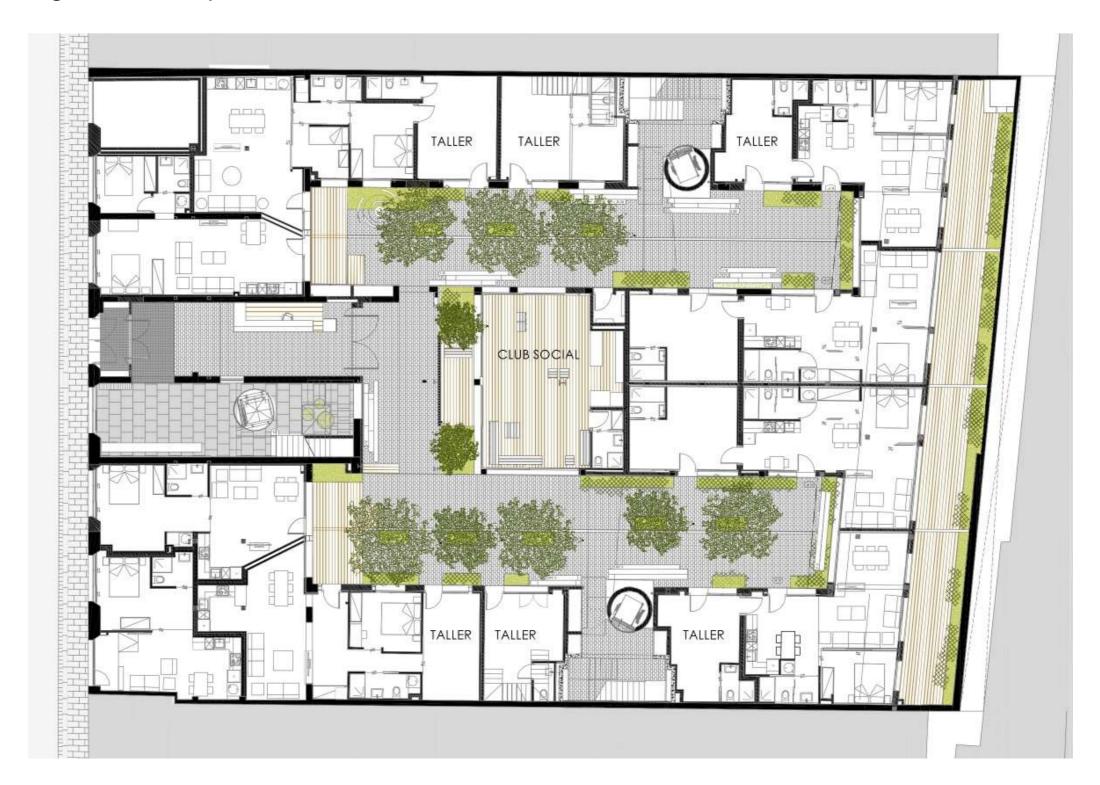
Ground floor plan of the proposed intervention. © Juli Pérez-Catalá Arquitectura
